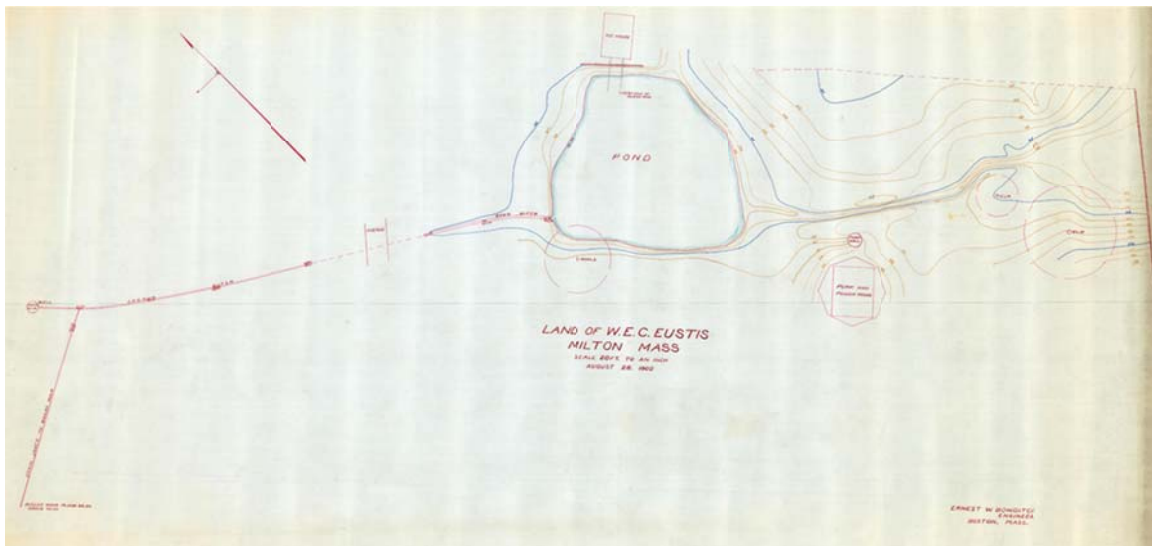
1902 Bowditch Plan (Source: Historic New England, Inc.)
